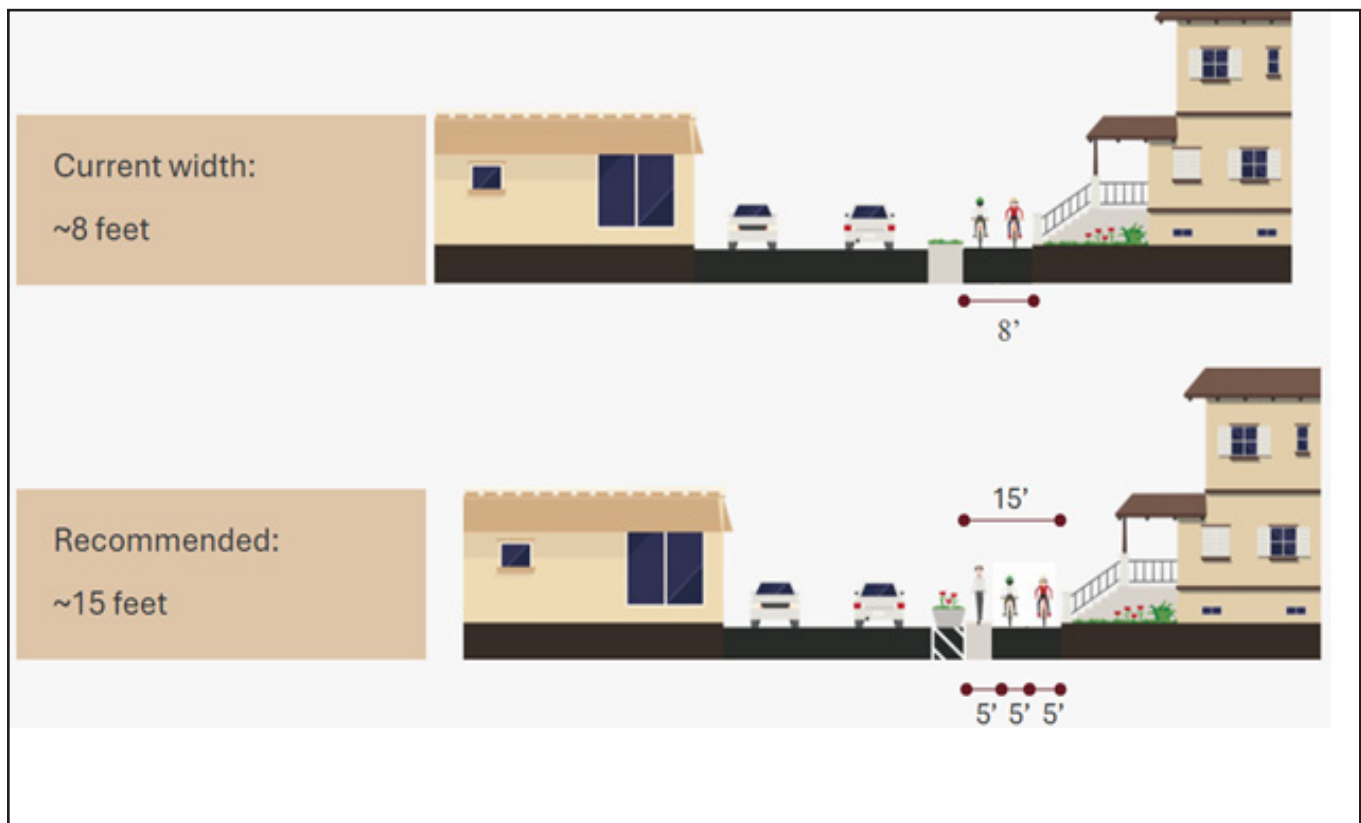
Section View of Proposed Widening (generated via StreetMix)
